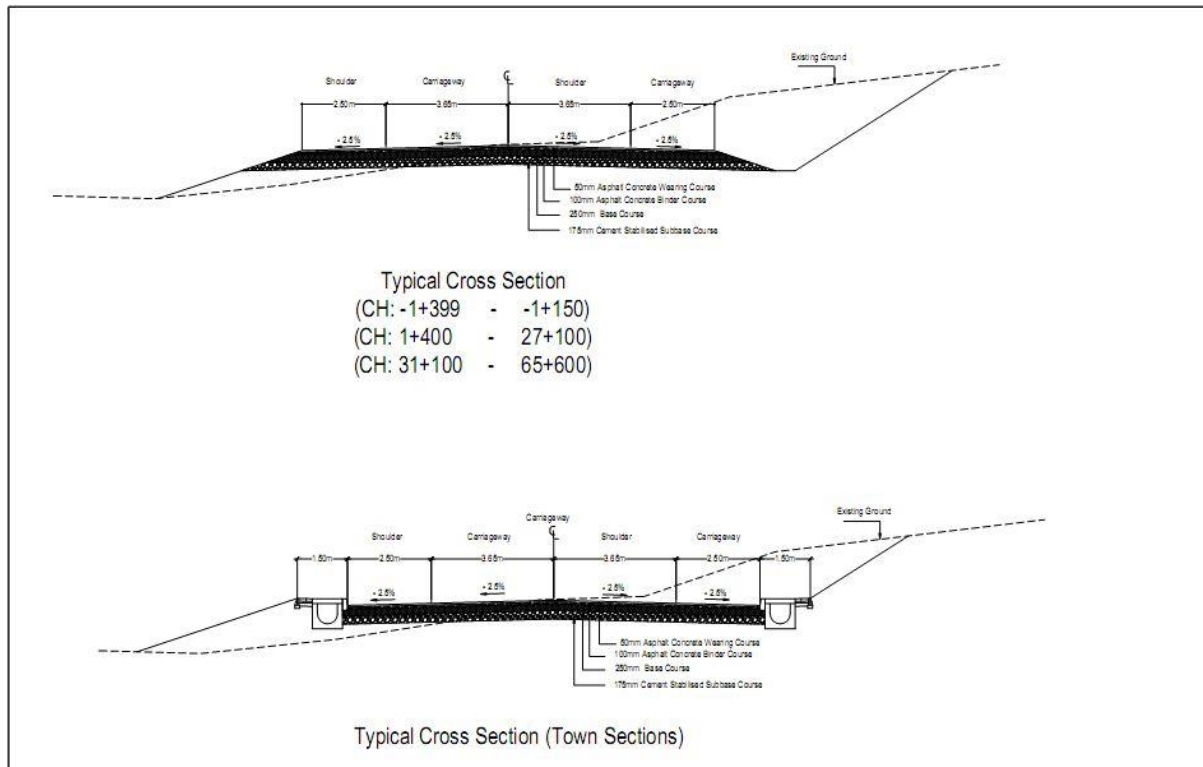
Typical Cross-Sections of Project Roads 1 & 3
